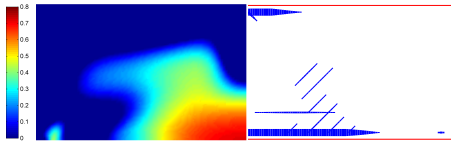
Damage distribution and optimized rebar layout, symmetric half of a beam with a point load.
